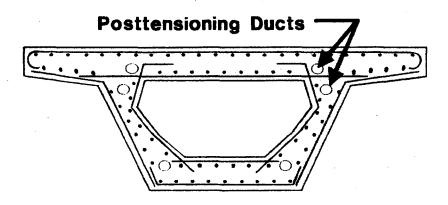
Longitudinal Reinforcement in a Concrete Box Girder
